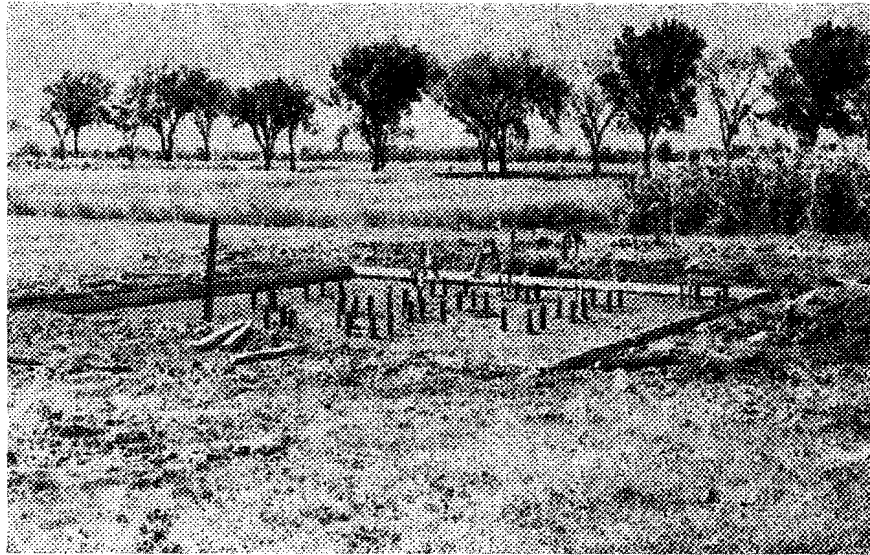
Flat slab forms prior to placing perimeter insulation. Note bakelite tubes for forming soil test holes in concrete slab.
